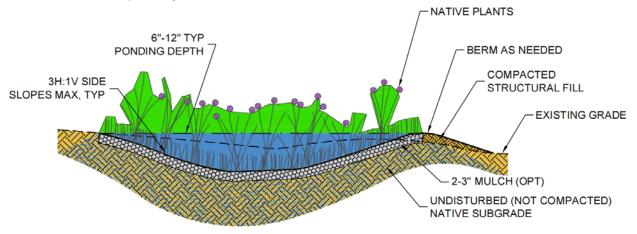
Example of a "Simple Infiltration Rain Garden". Not pictured, but also applicable to the above criteria are versions of a stormwater planter or LID swale (see Appendix F Standard Details).
